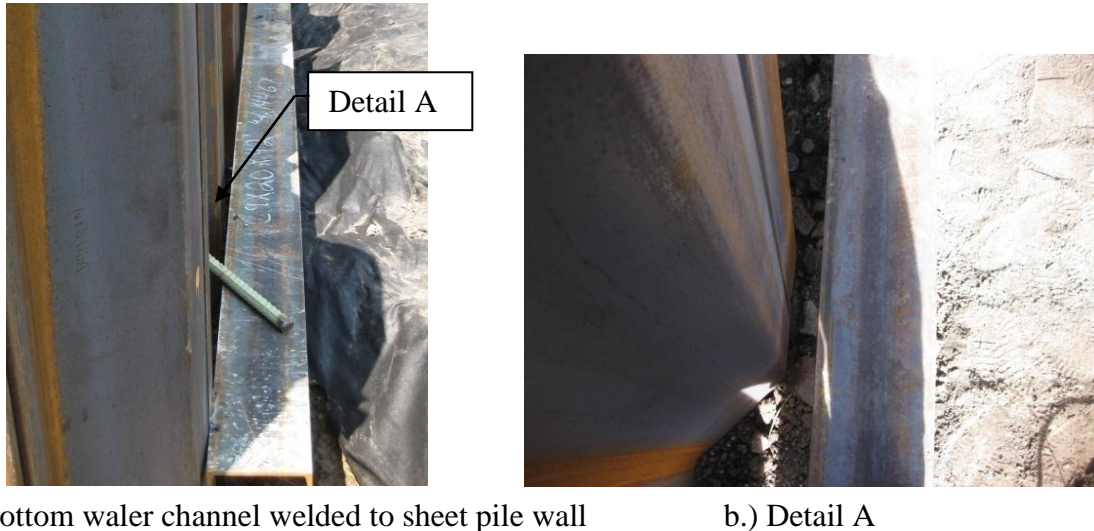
Waler not in contact on all sheet piles in west abutment
